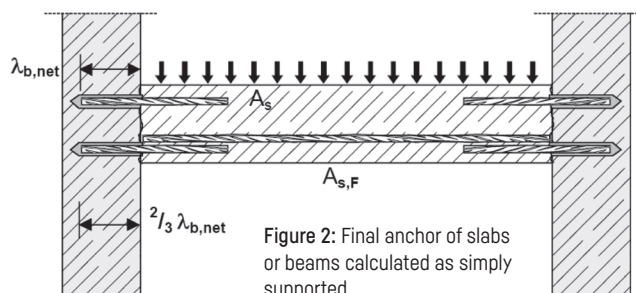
Final anchor of slabs or beams calculated as simply supported.
